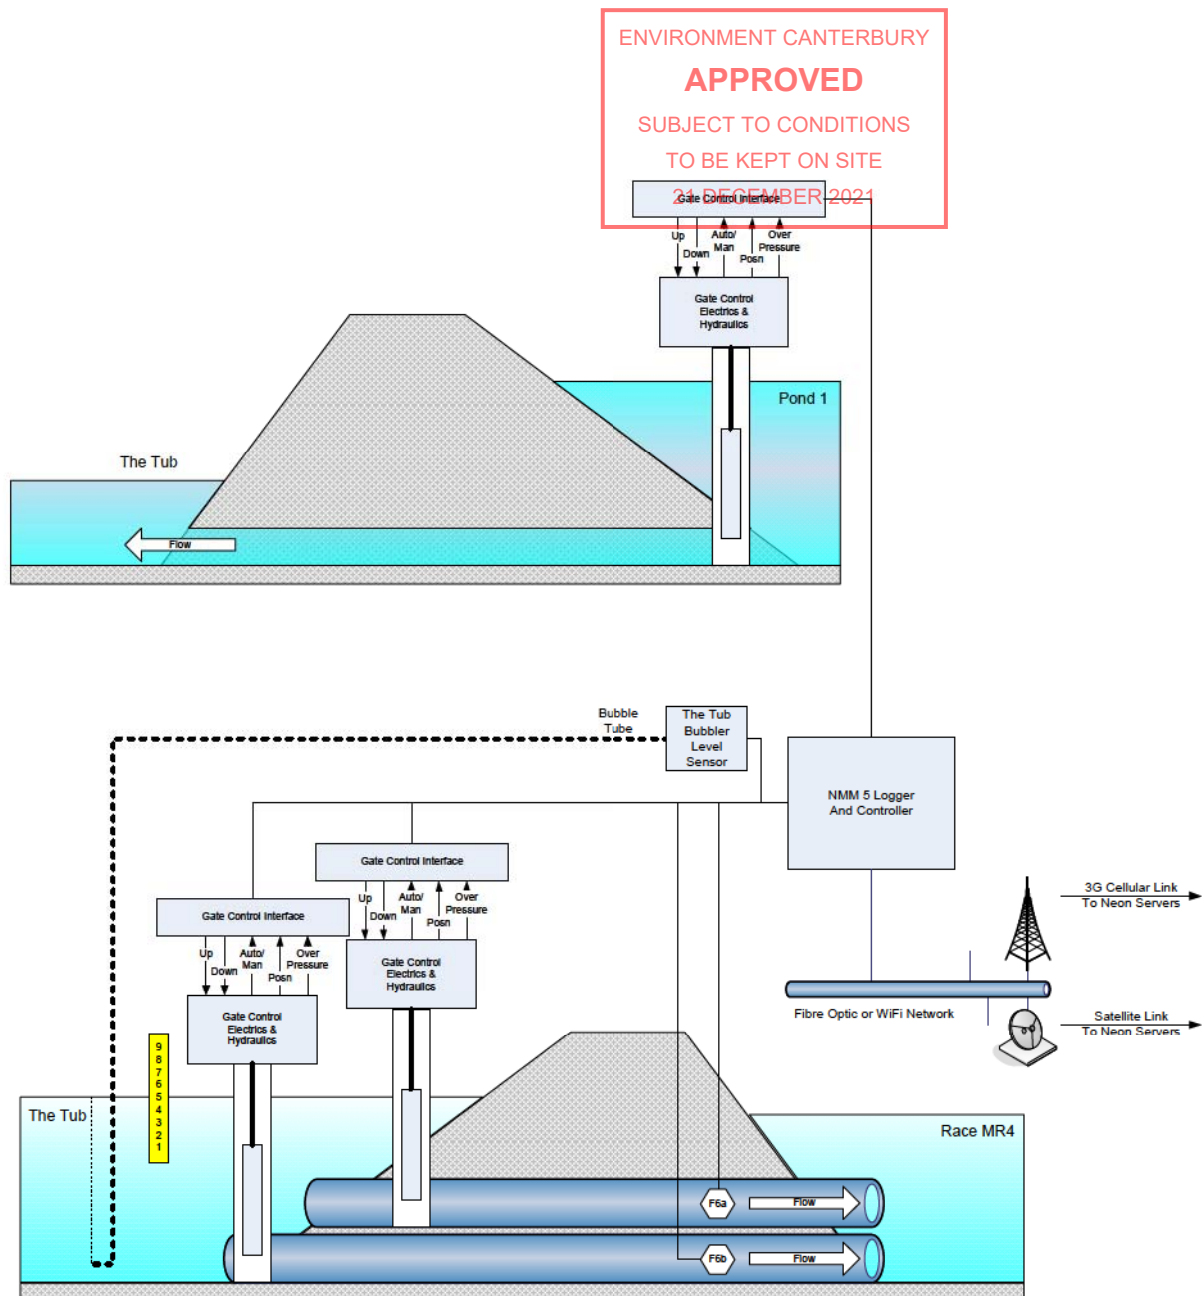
NMM5 Pond 1 Outlet to the Tub and Tub Outlet to MR4 Schematic
